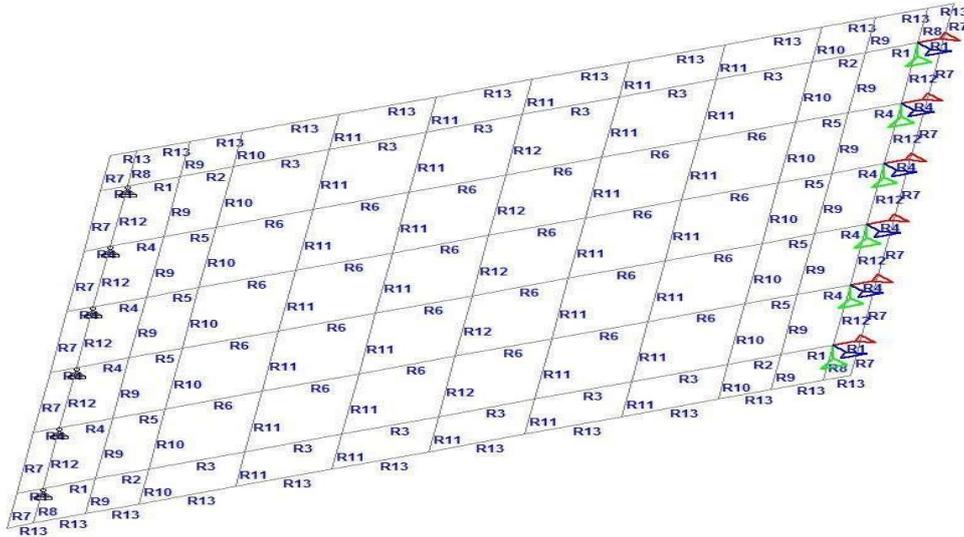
Stadd Analysis of Skew Bridge (Superstructure).
